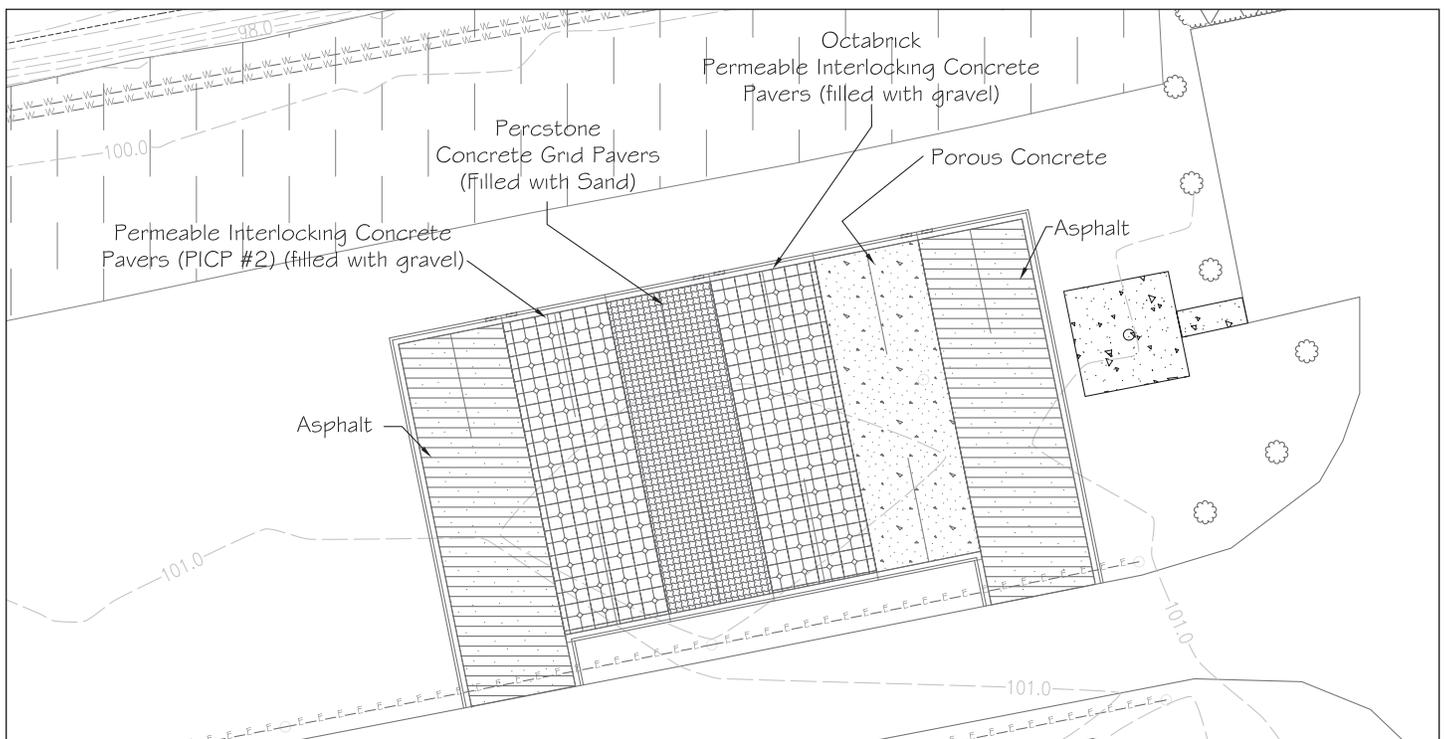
Parking lot plan showing the location of asphalt, pervious (porous) concrete, grid and two permeable interlocking concrete pavements.
